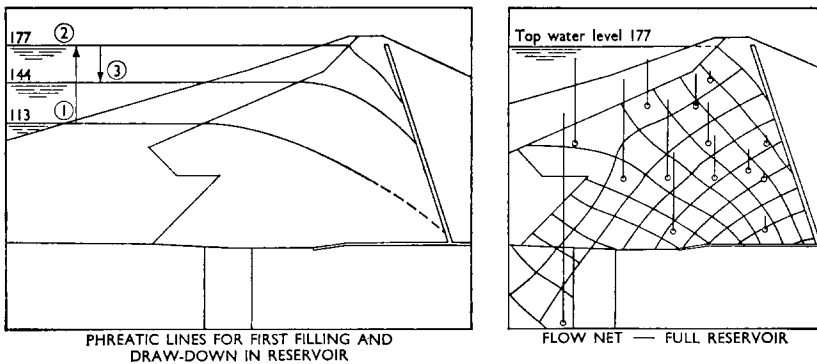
CROSS SECTIONS THROUGH THE CORE OF THE SHEK PIK DAM
